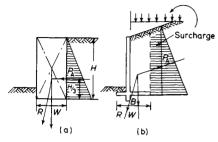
Forces acting on a free-standing retaining wall. (a) Simple gravity wall; (b) cantilever wall
